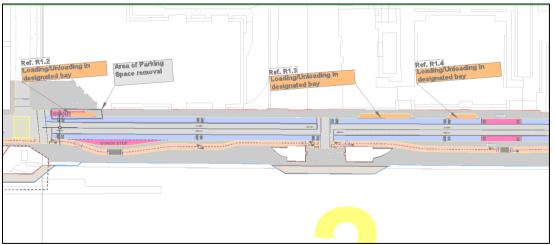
Proposed scheme design and parking changes along North Wall Quay (between Common Street junction and Guild Street junction).
